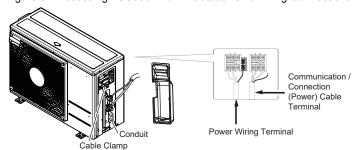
Accessing LUU180-240HV Outdoor Unit Wiring Connections.
